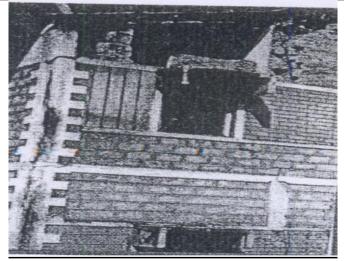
Damage to wall supporting split level roof – ITBP Campus, Mahidanda.
